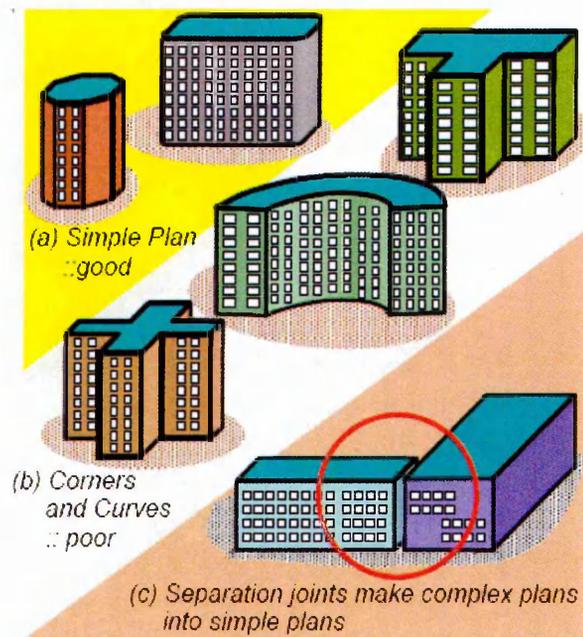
Simple plan shape buildings do well during earthquakes (IITK-BMTPC, 2002)
